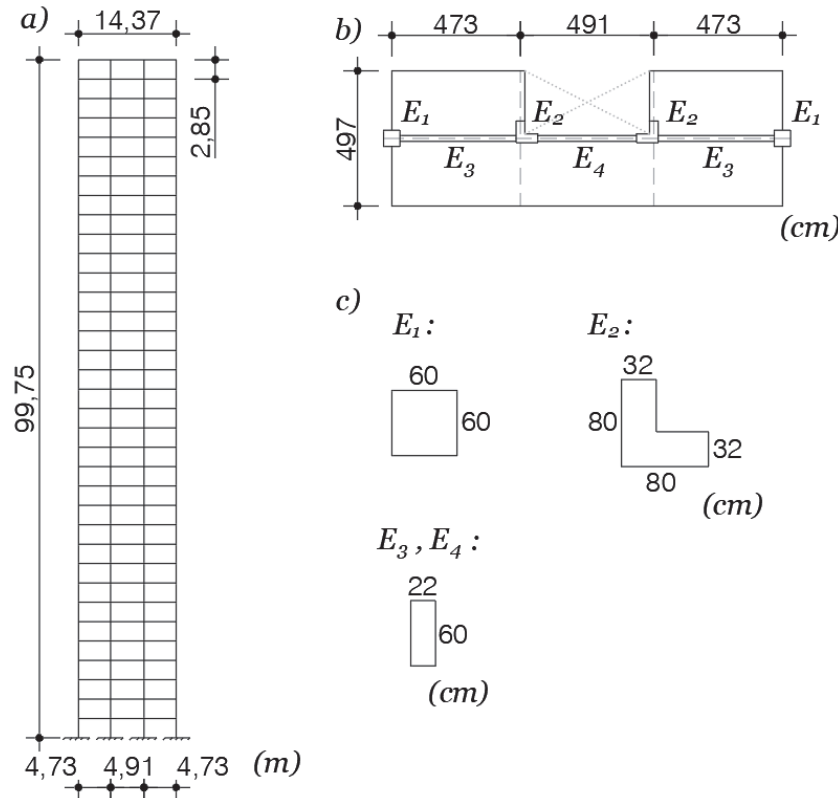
Structure analyzed in uncontrolled original configuration (C1). a) 2D frame, b) Cross section in plan considered, c) Cross section of columns (E1 and E2) and beams (E3 and E4).
